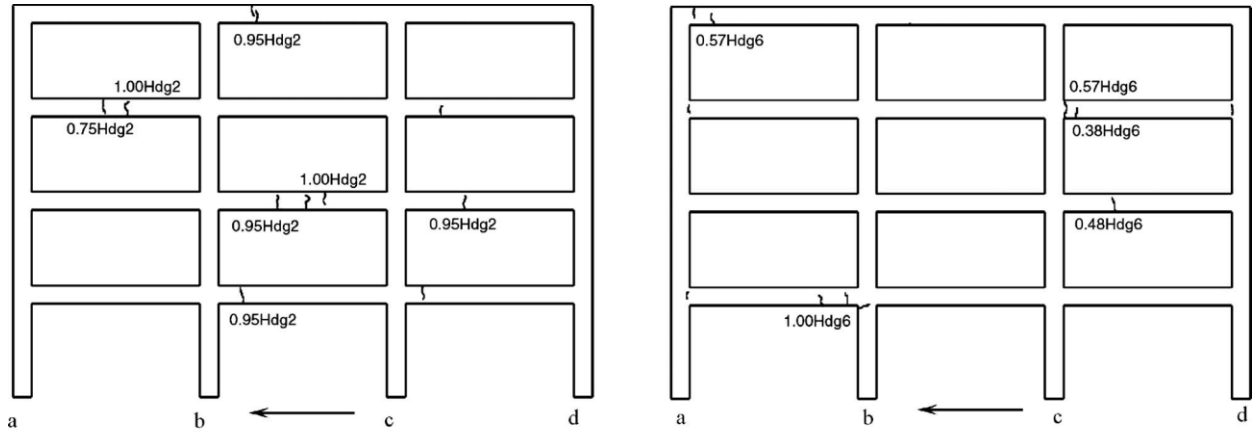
Localization of the cracks on the frame and corresponding excavation level. Arrows show the excavation position. Side notation indicated the level of excavation where that crack appeared (Laefer et al. 2009).
